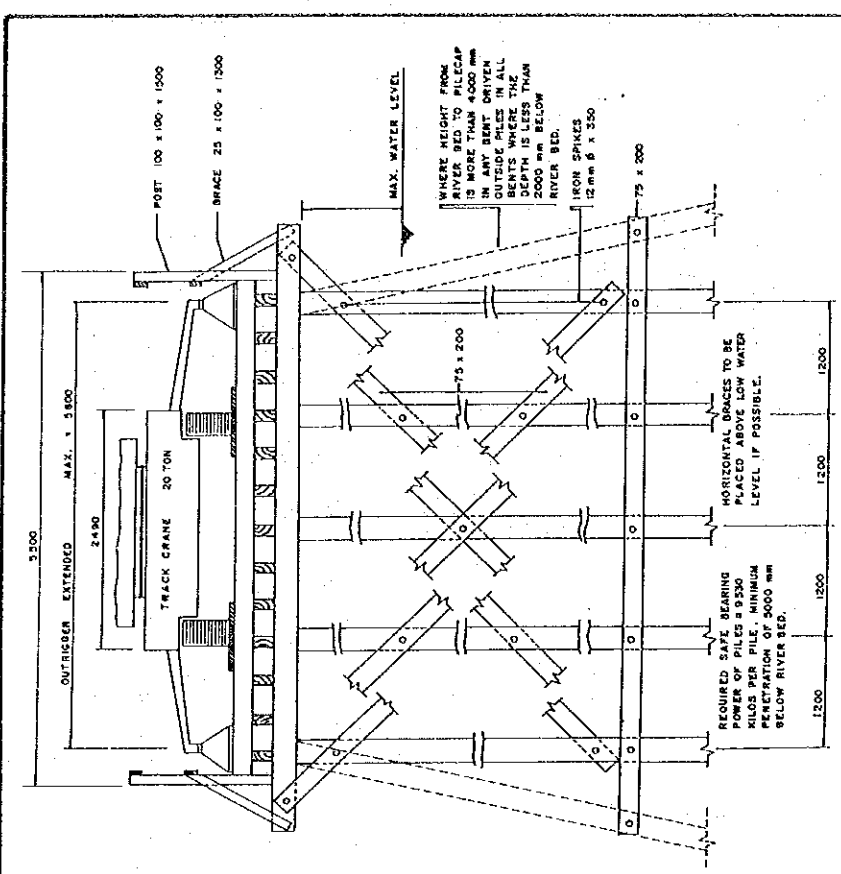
WOODEN BENT FOR STEEL GIRDER ERECTION
